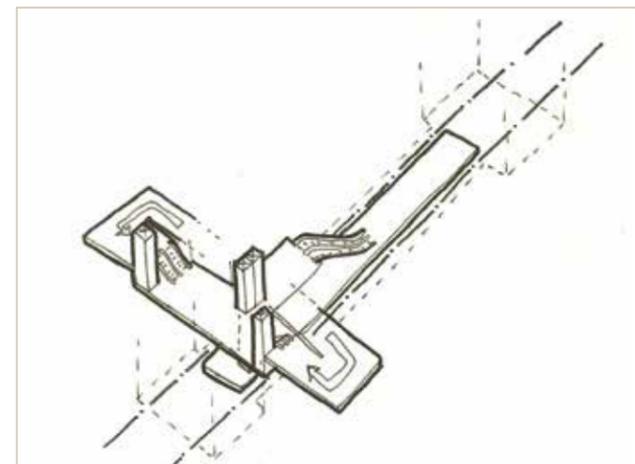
The proposed Smith Street station would predominantly use escalators to provide access to the underground platforms
